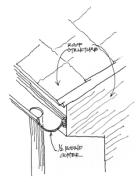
Hung gutters are common on Solebury Township buildings. Half-round gutters and smooth-round downspouts are recommended.
